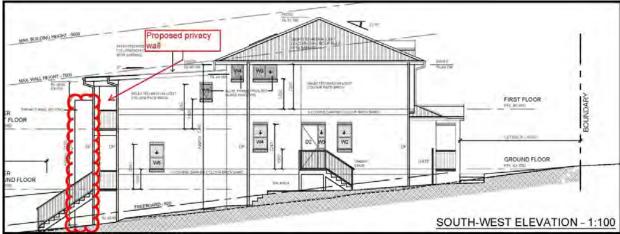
Elevation showing loction of proposed privacy blade wall extending out from the party wall to reduce internal overlooking opportunities.
